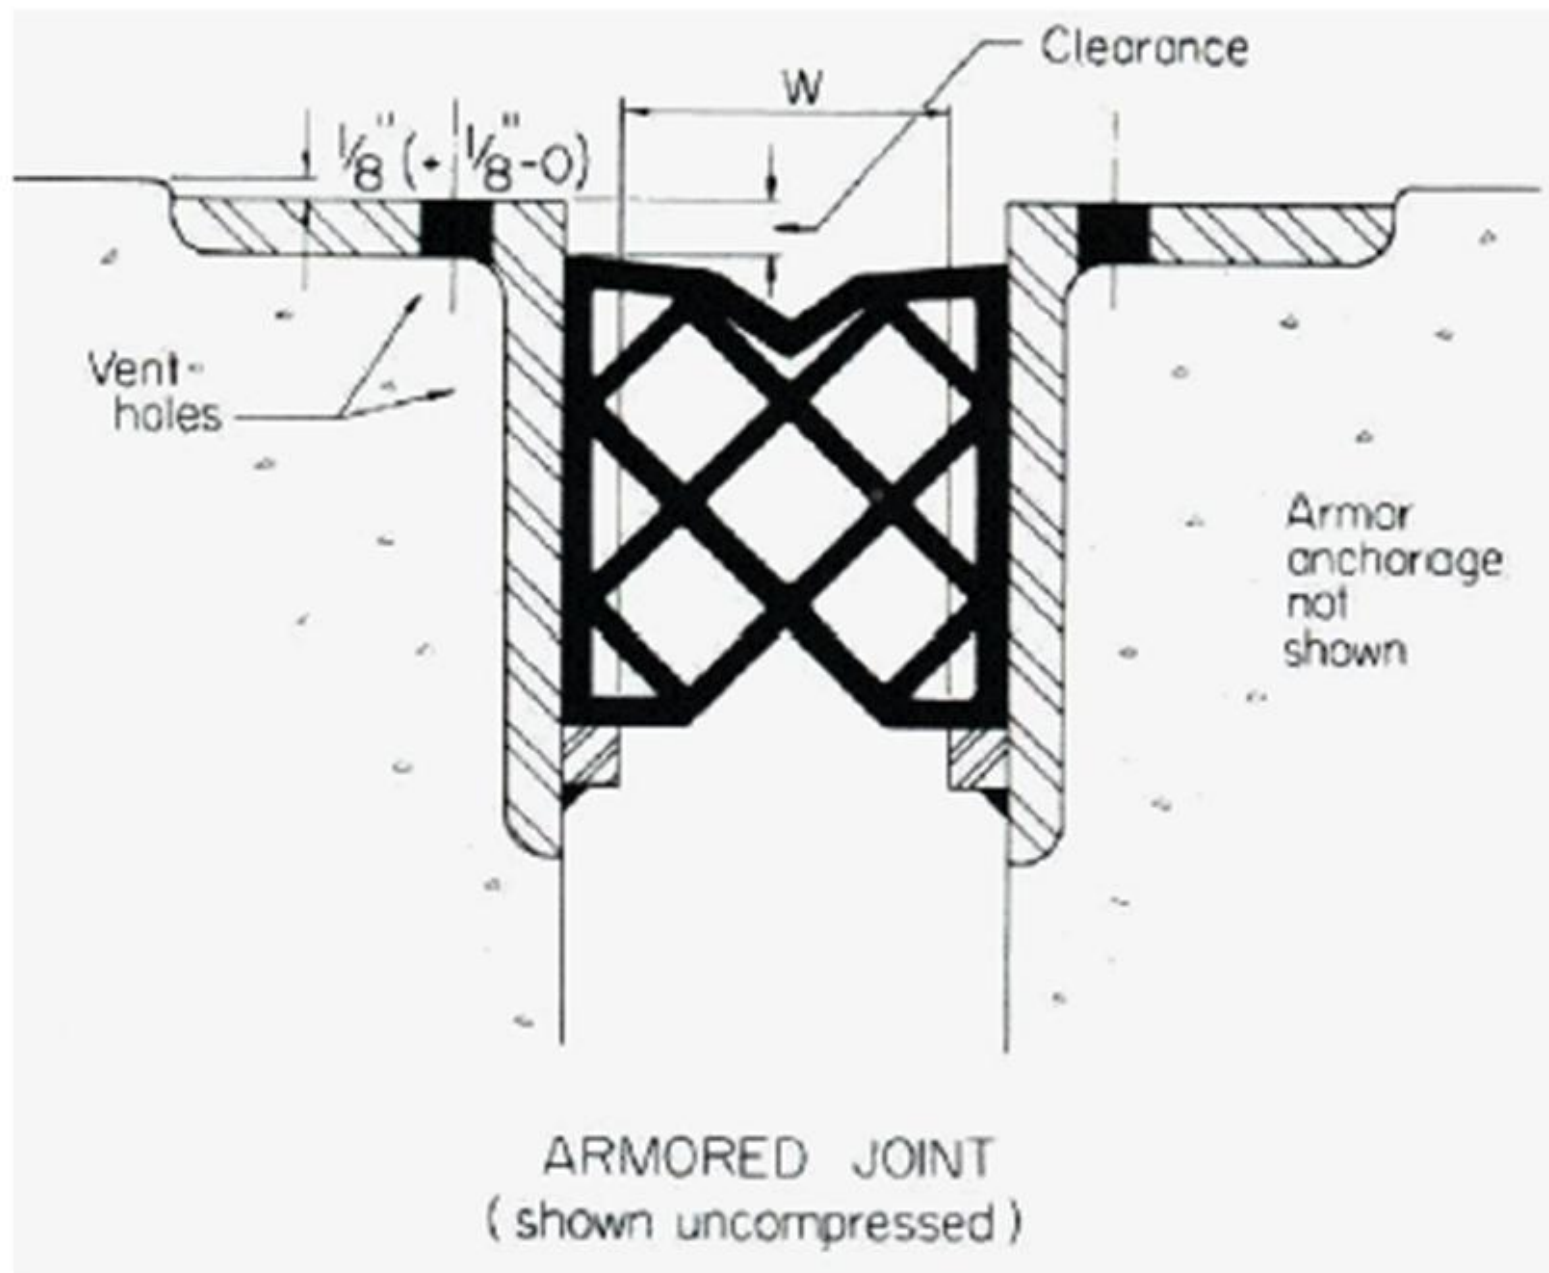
Cross Section of a Compression Seal with Steel Angle Armoring
